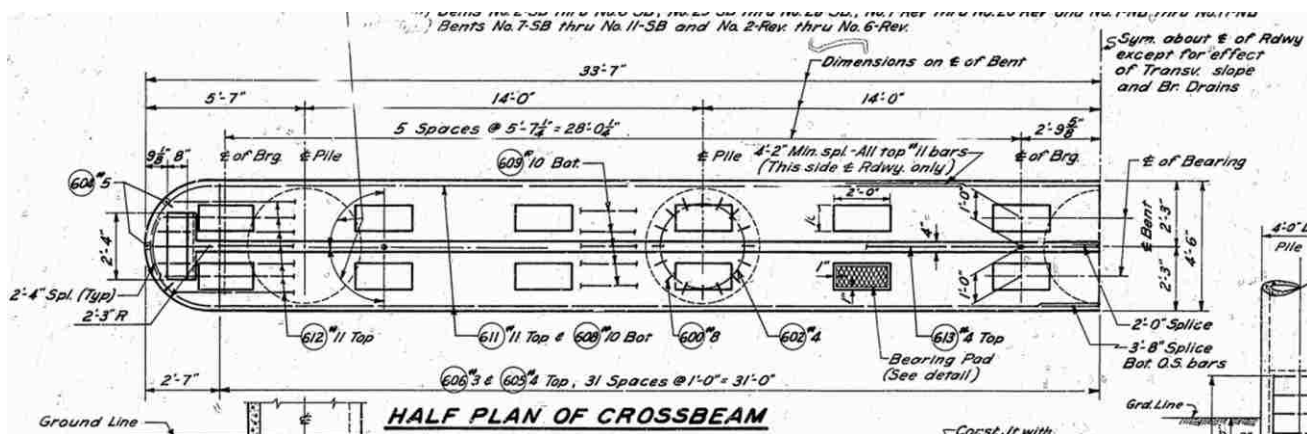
Plan view of cap beam for typical bent (Galer-Lakeview)
